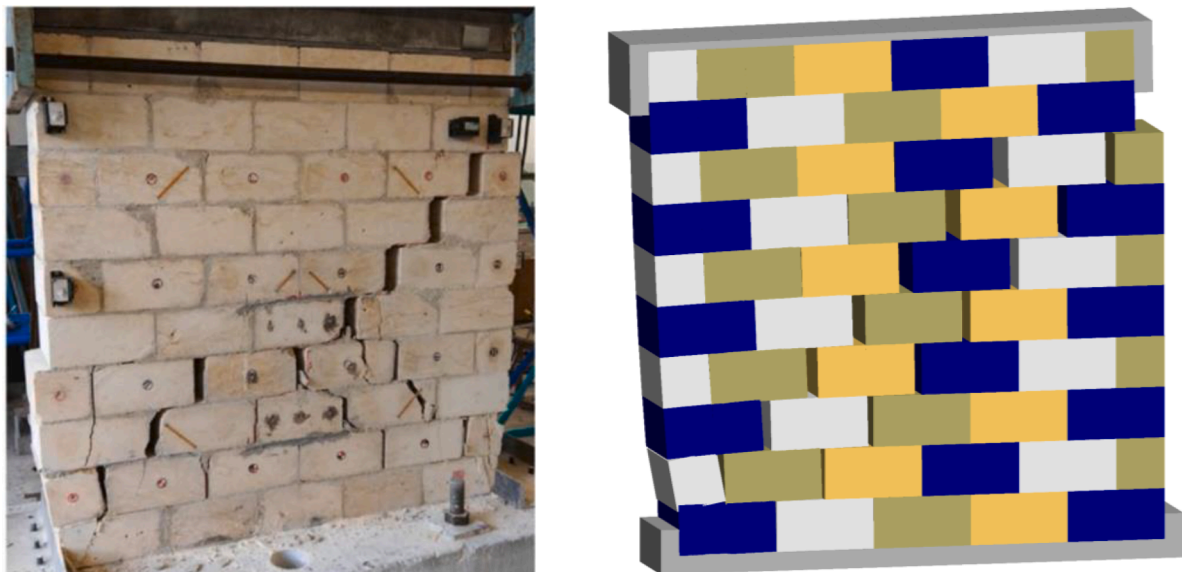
Left: Stone masonry wall panel after the test; Right: Damage state of the wall at the last stage of the DEM analysis.
